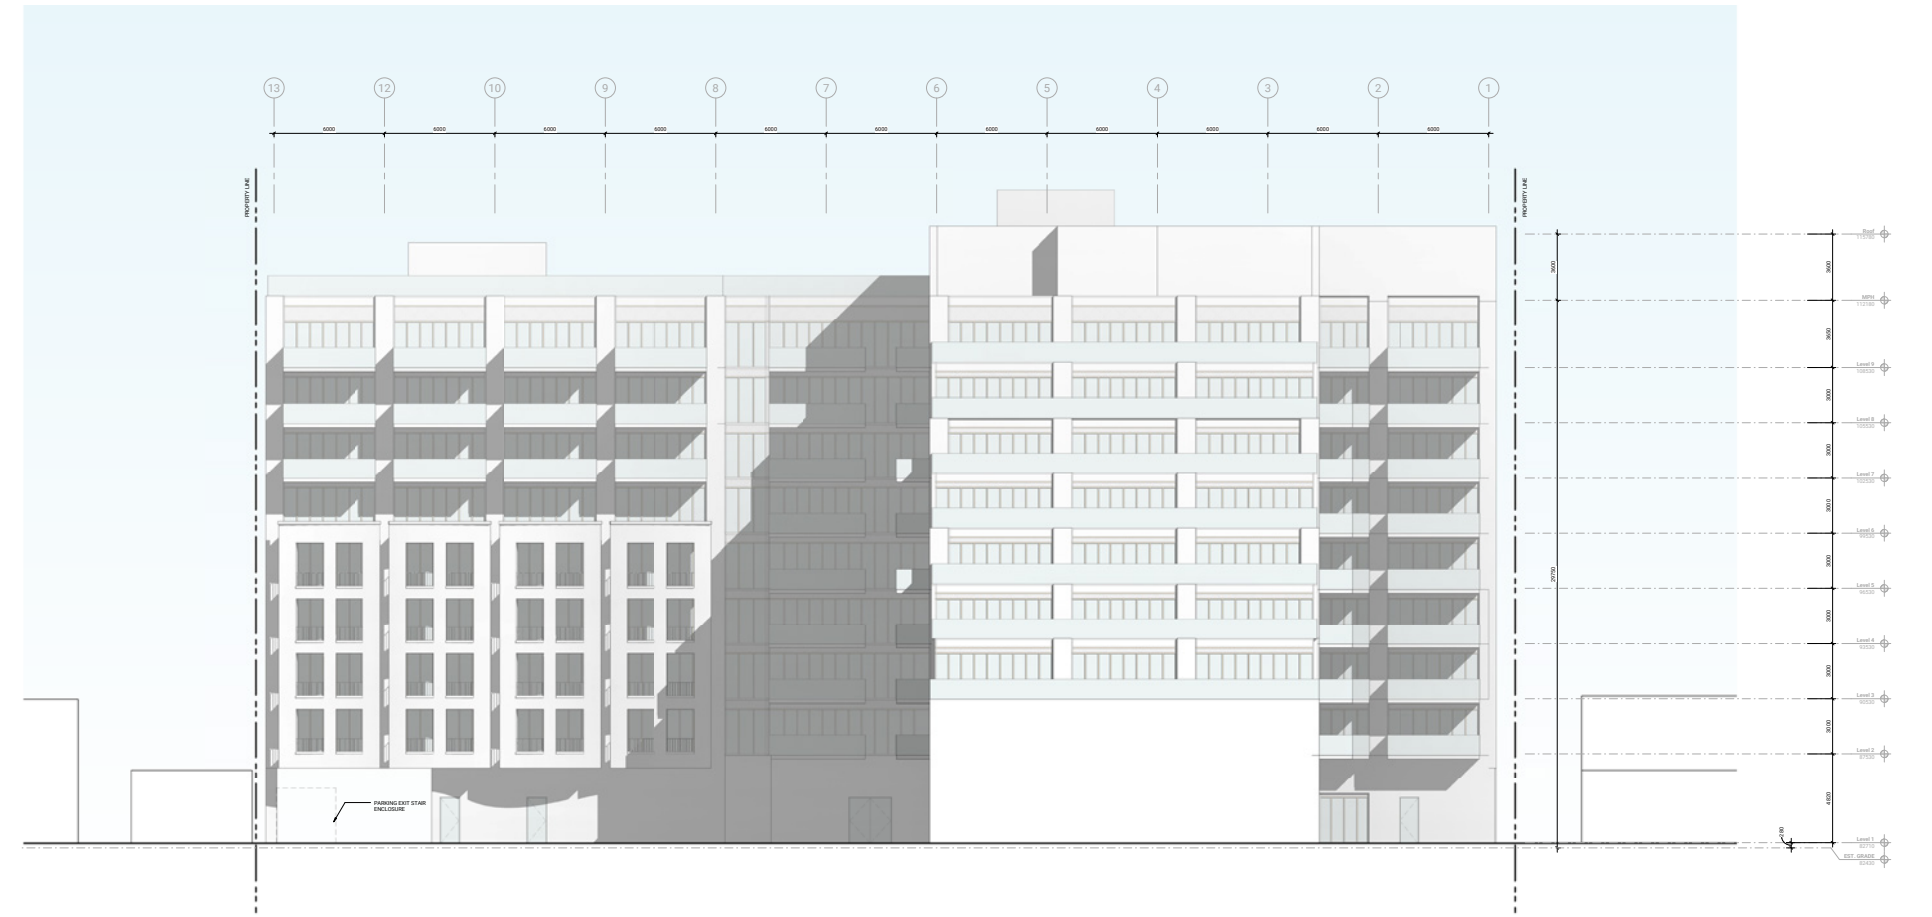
North Elevation (Prepared by Diamond Schmitt Architects)
